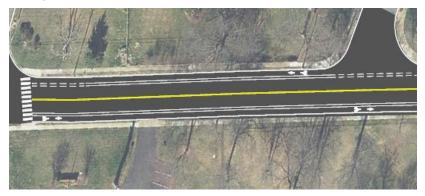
Buffered Bike Lanes on Church Street – Concept 2
